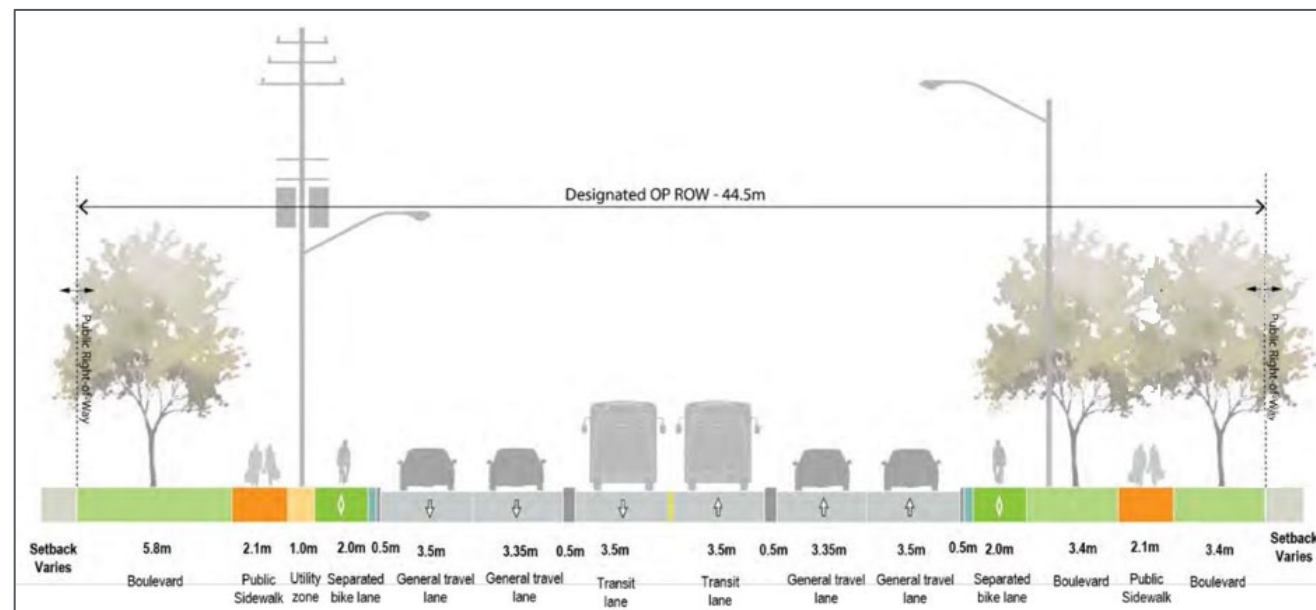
Lakeshore Connecting Communities Proposed Typical Cross-Section (Mid-Block)
